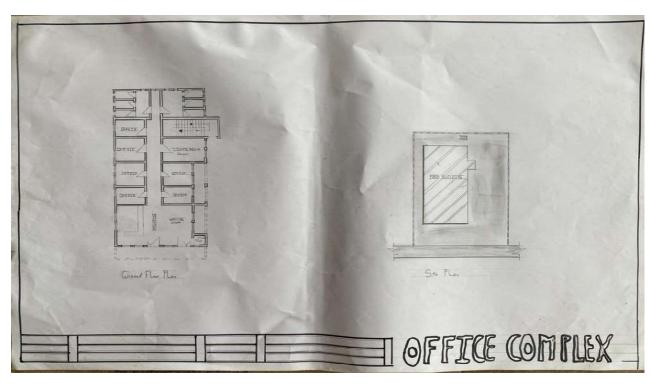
SHOWING THE LOCATIONAL TYPICAL FLOOR AND SITE PLAN OF CASE
